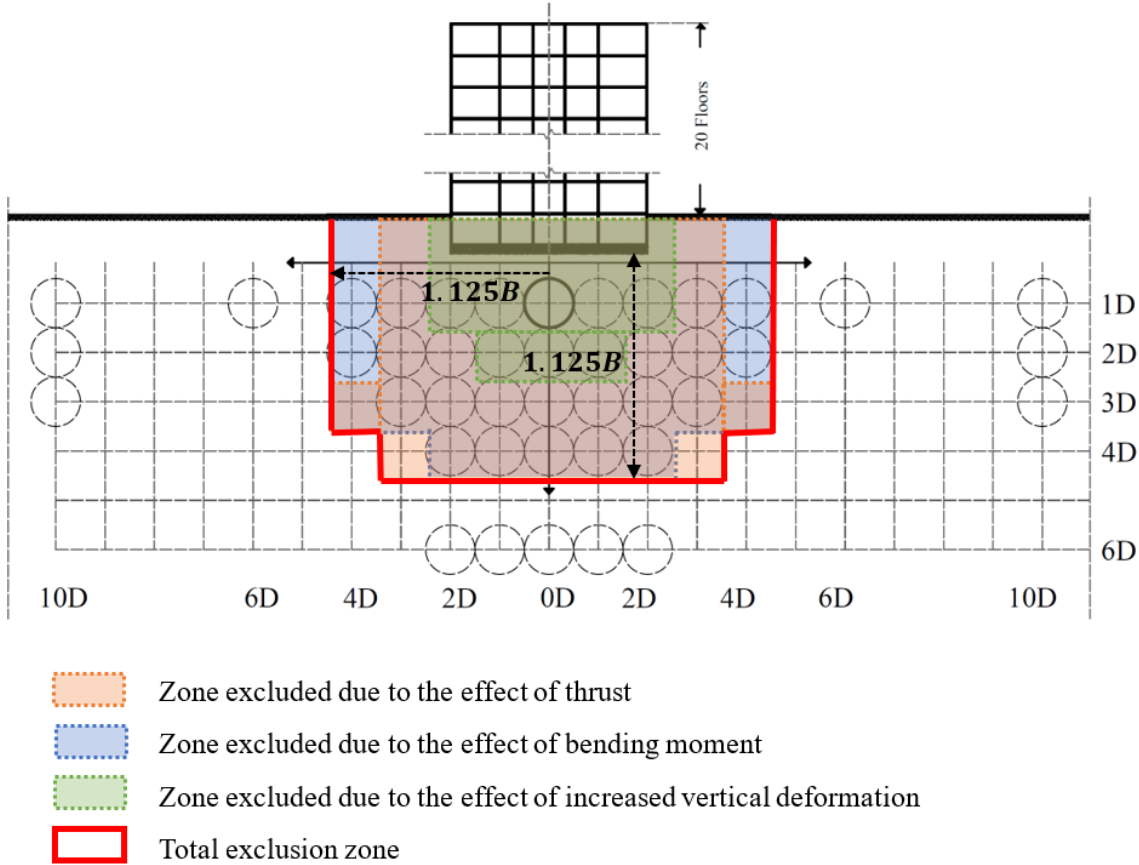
19: Exclusion zone for new construction close to a pre-existing tunnel
